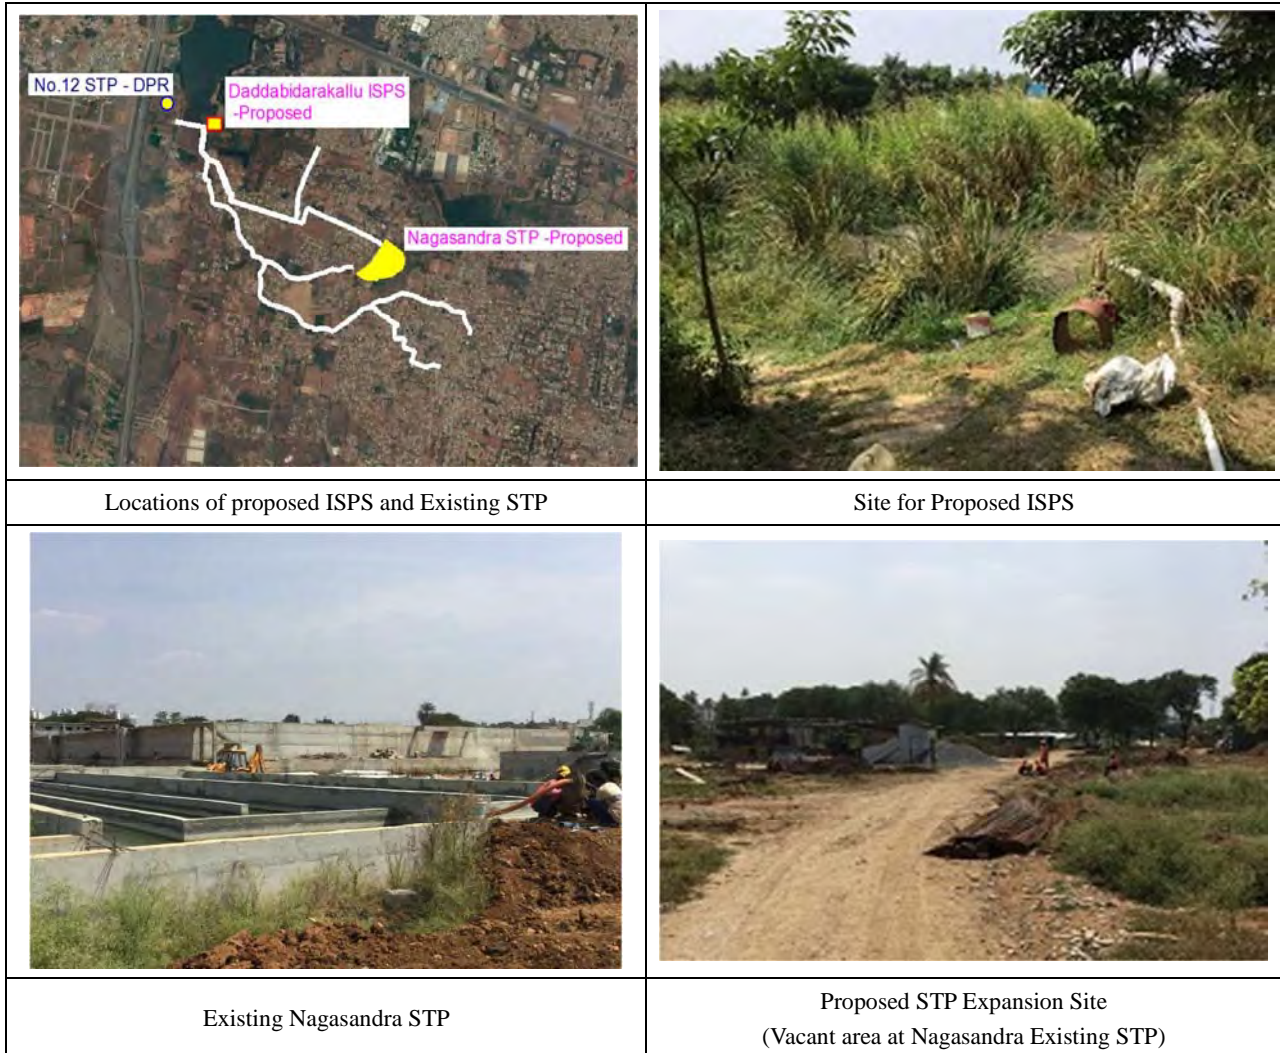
Location of Daddabidarakallu ISPS, Nagasandra STP and Alignment of Main Sewer Line
